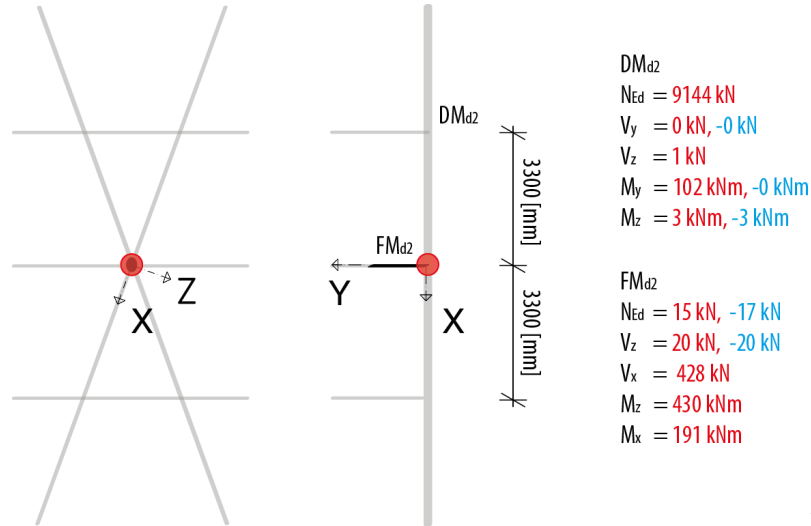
Detail 2, normative load attached floor beam (Local coordinate system)
